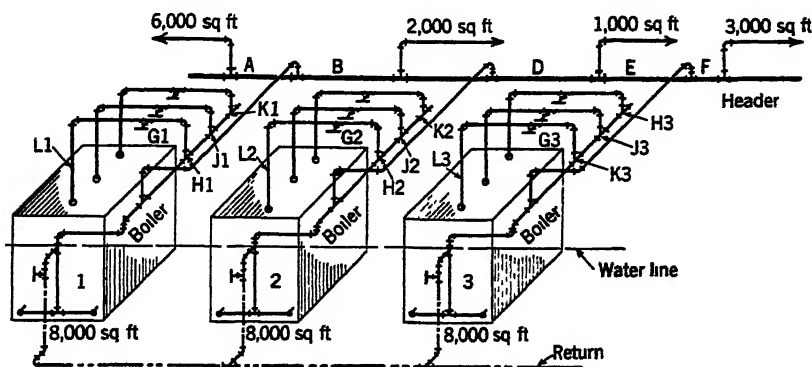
BOILER STEAM HEADER AND CONNECTIONS
